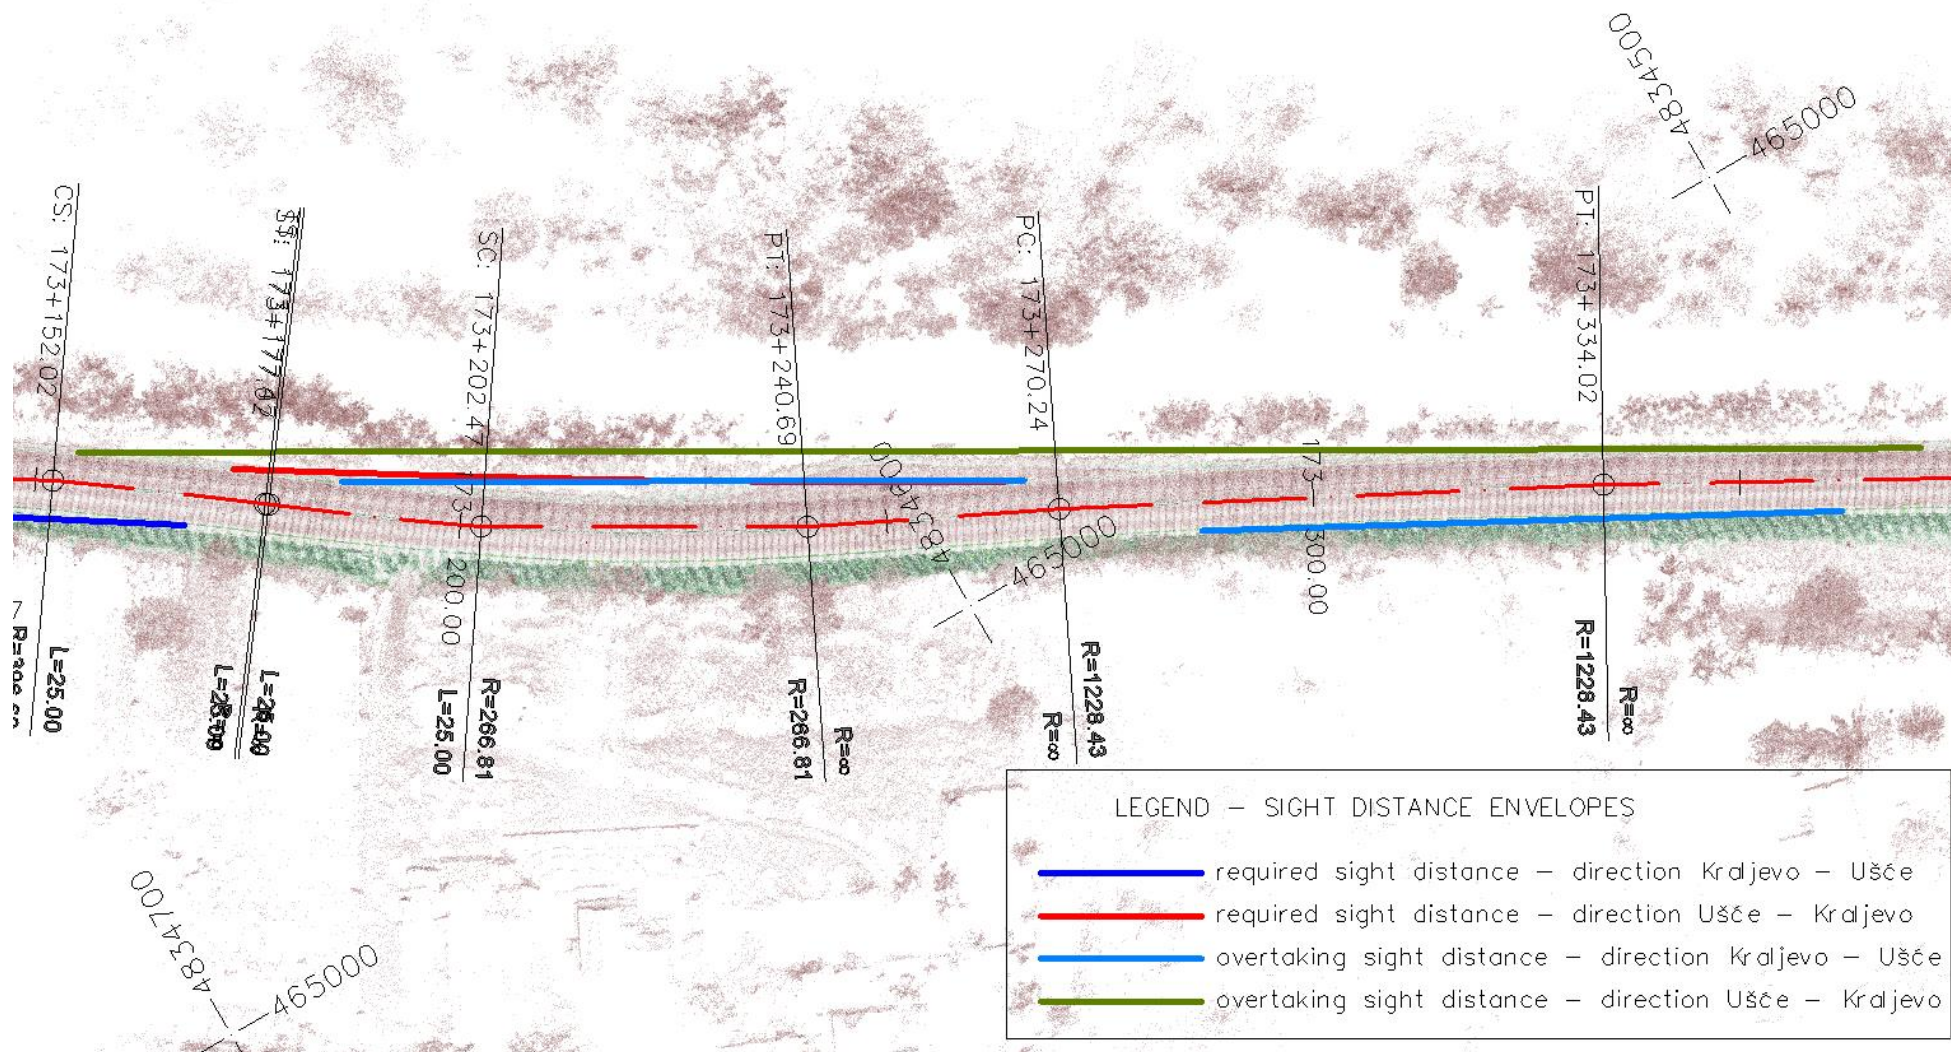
Example of a situational plan with envelopes of required and overtaking sight distance entered
